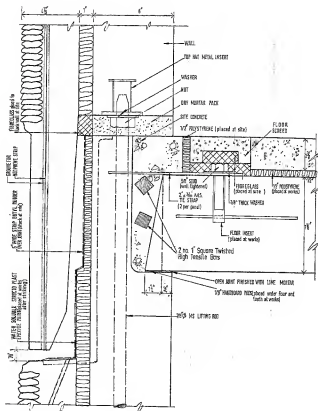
Figure D *Joint H.2. Horizontal joint between floor slab and flank wall
